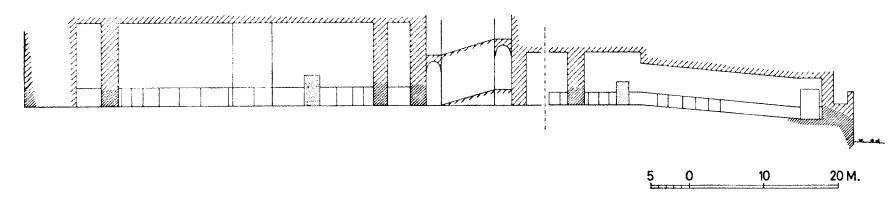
Reconstructed elevation of section Z-Z on fig. 7
